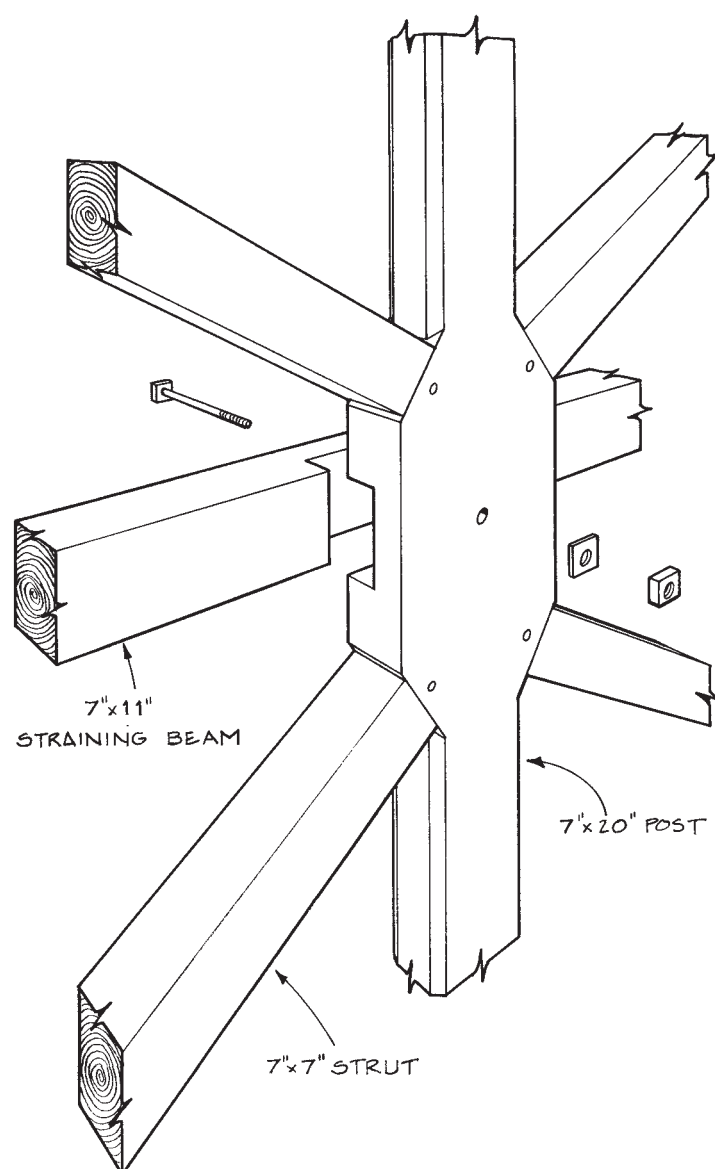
Central Moravian 7x20 oak kingpost, accommodating struts in four directions and the halved crossing of a straining beam.
